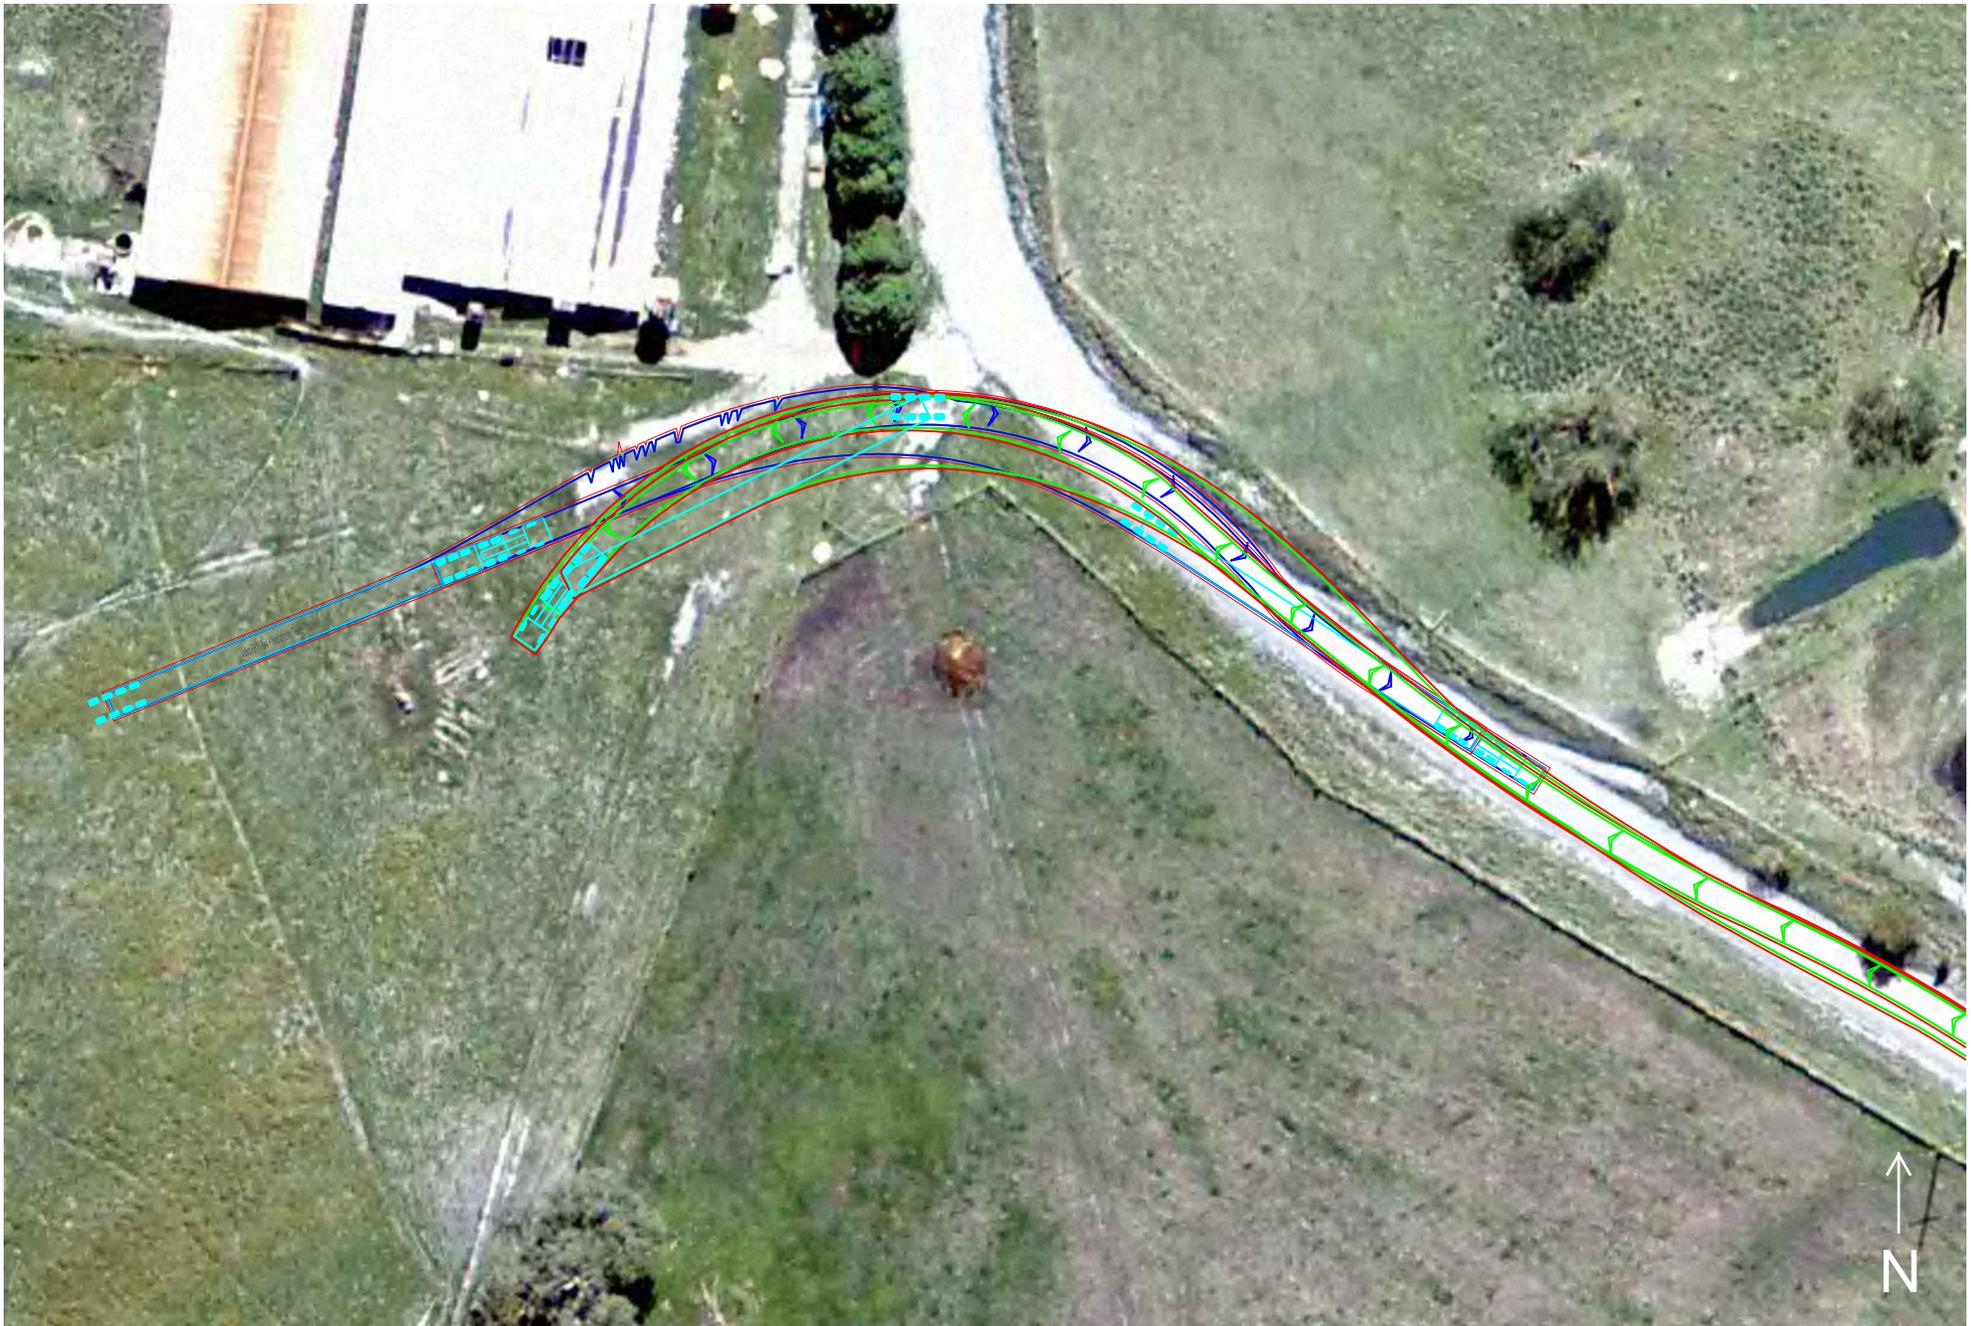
Errowanbang Road / access road to WTG 21-31 intersection blade transport vehicle swept path
